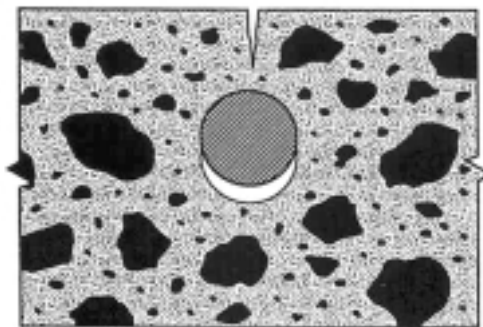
Crack in plastic concrete due to uneven settlement.
